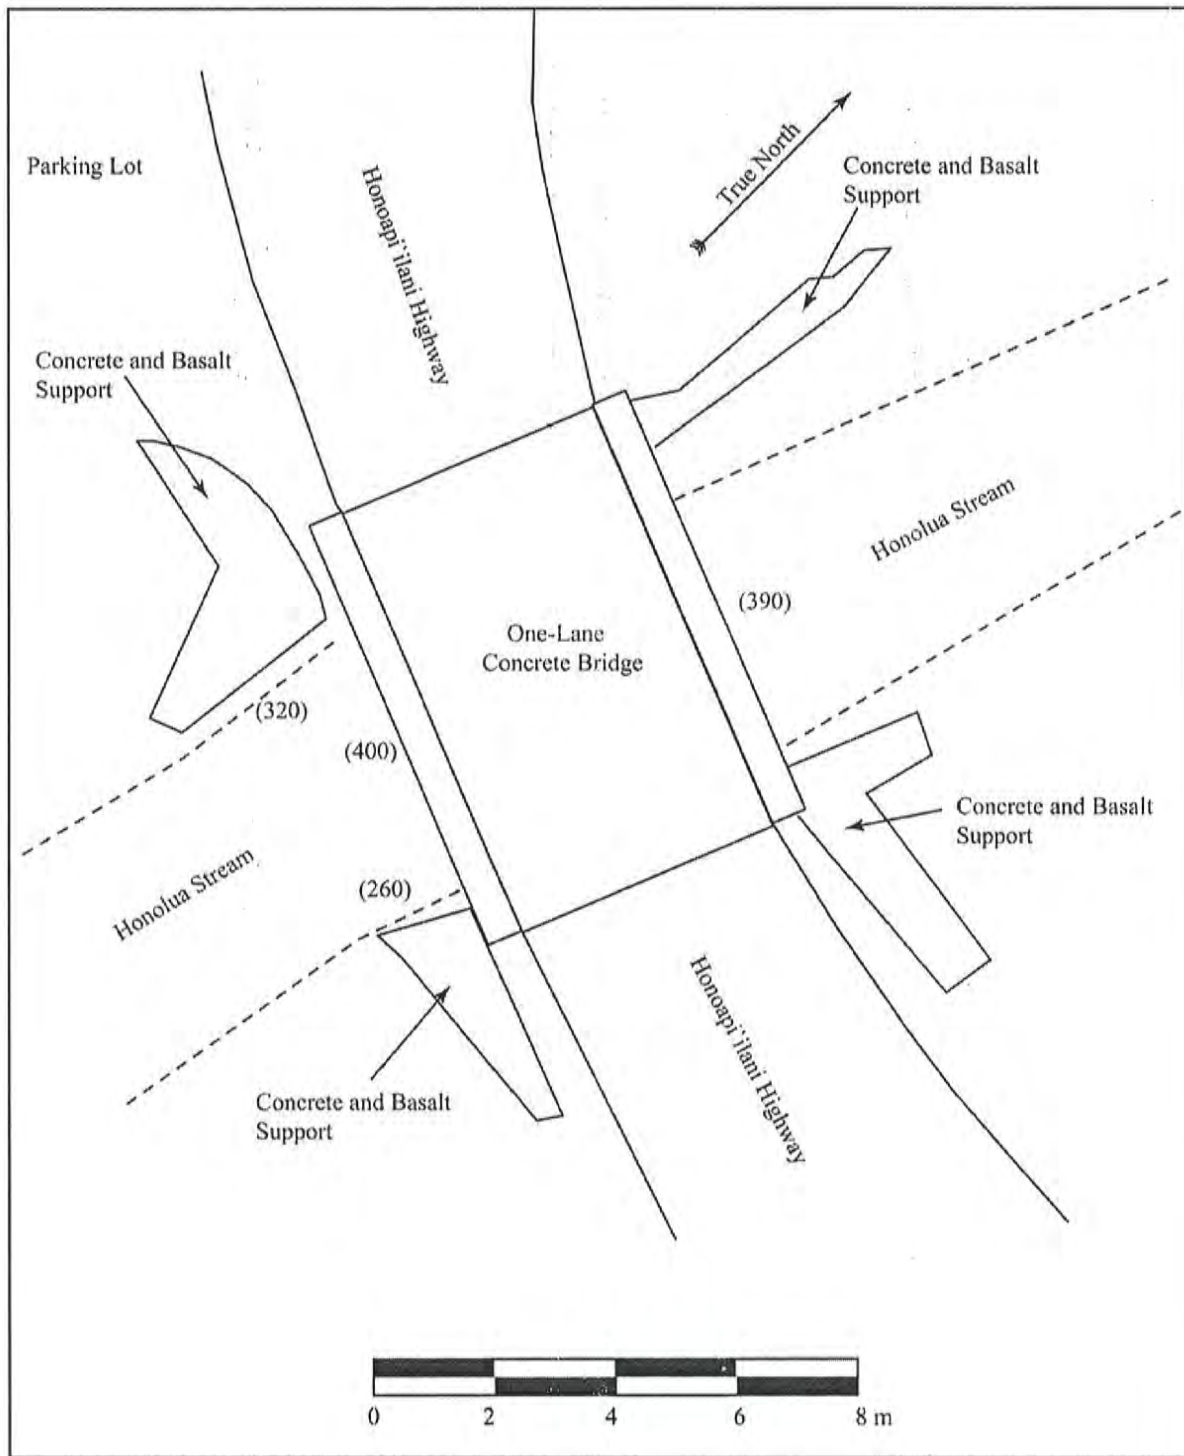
Plan View of Bridge (SIHP No. 1754 Feature 11)
